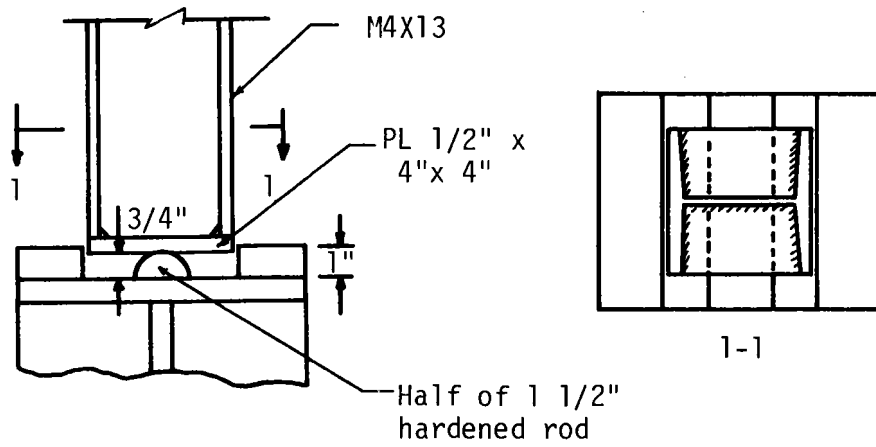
LOADING ASSEMBLY AND JOINT CONNECTIONS
